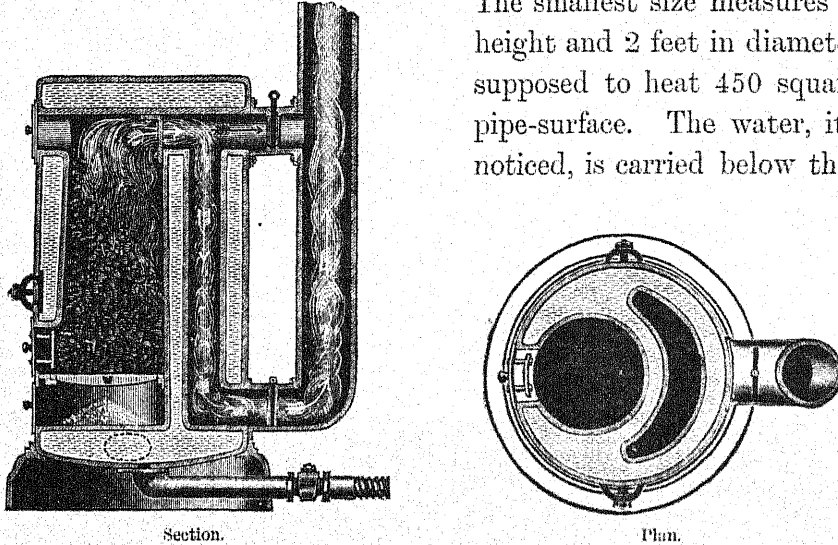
Plan and Section of the "Marlor" Boiler.
